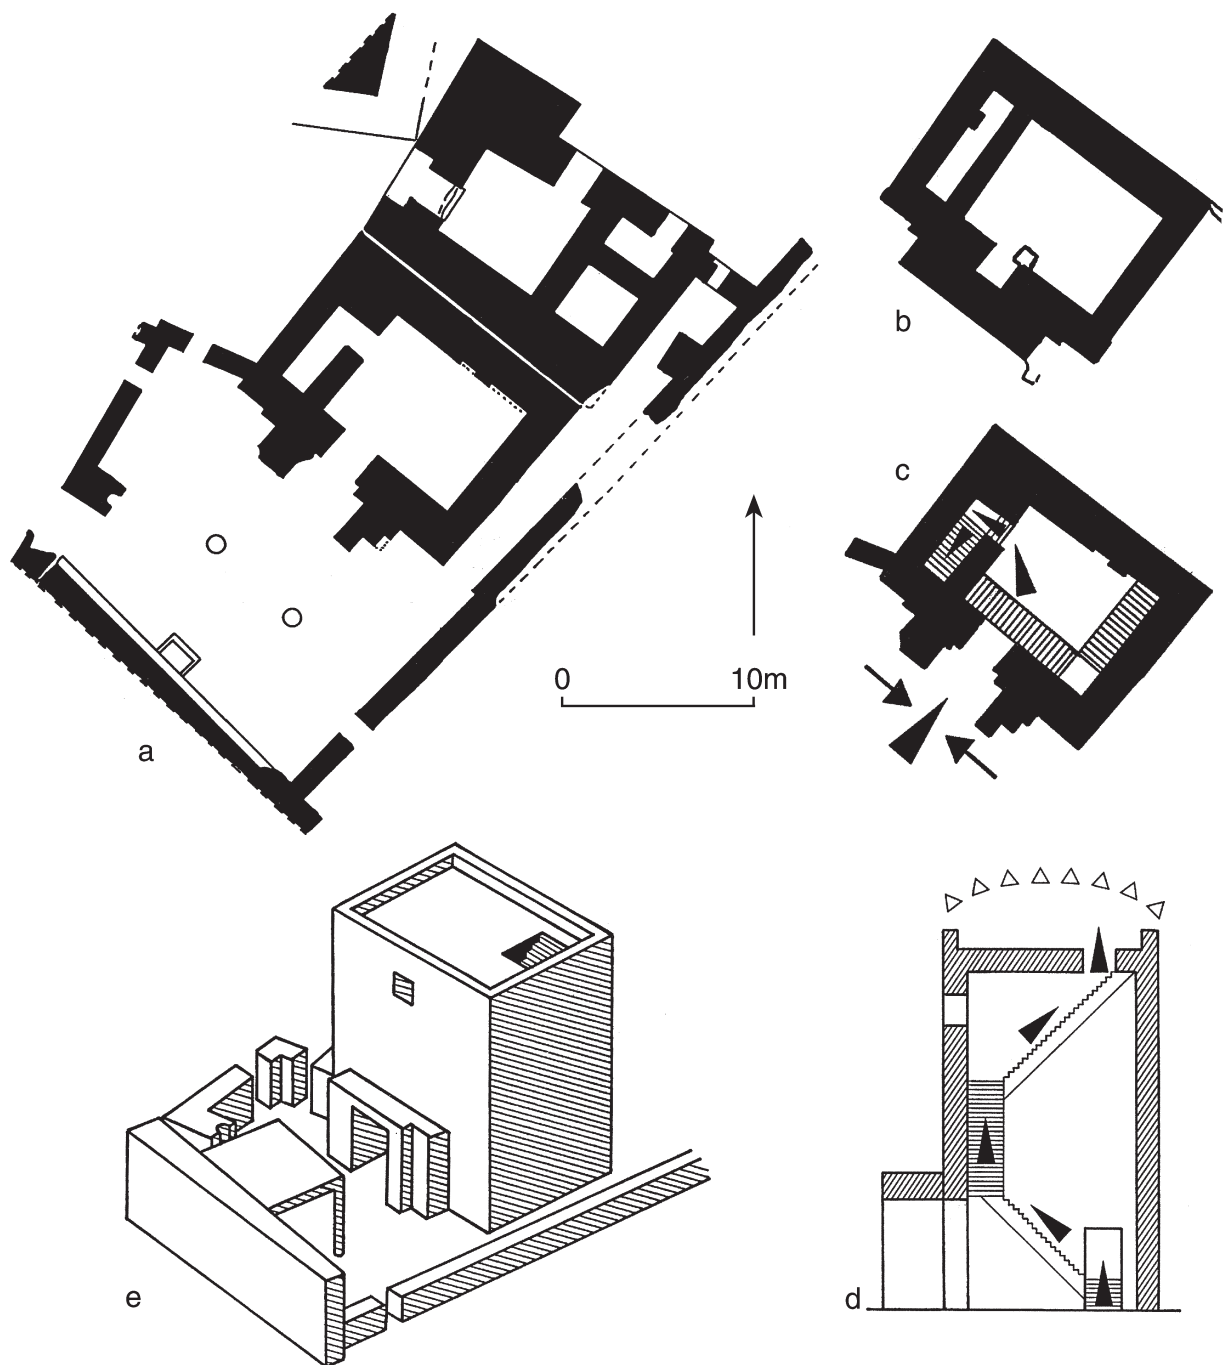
Plan and reconstruction of the temple-tower of Ninhursag.
